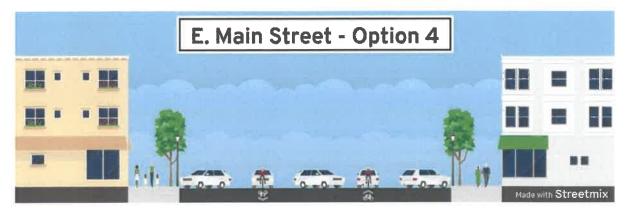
Downtown Streetscape Alternate Layout - Option 4
